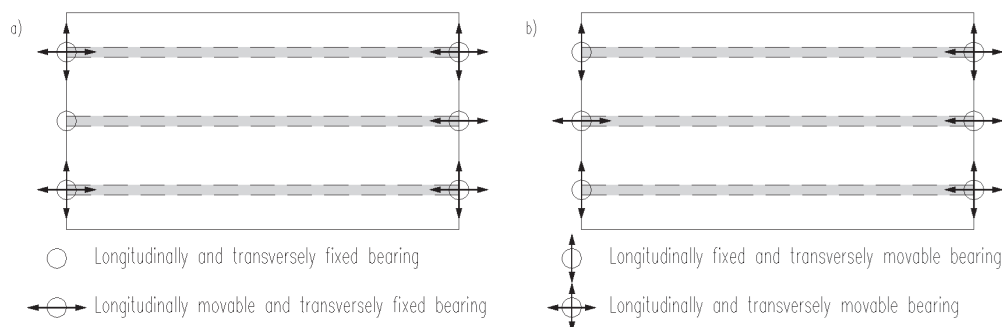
Bridge superstructure with one (a) and two (b) longitudinally fixed bearings
